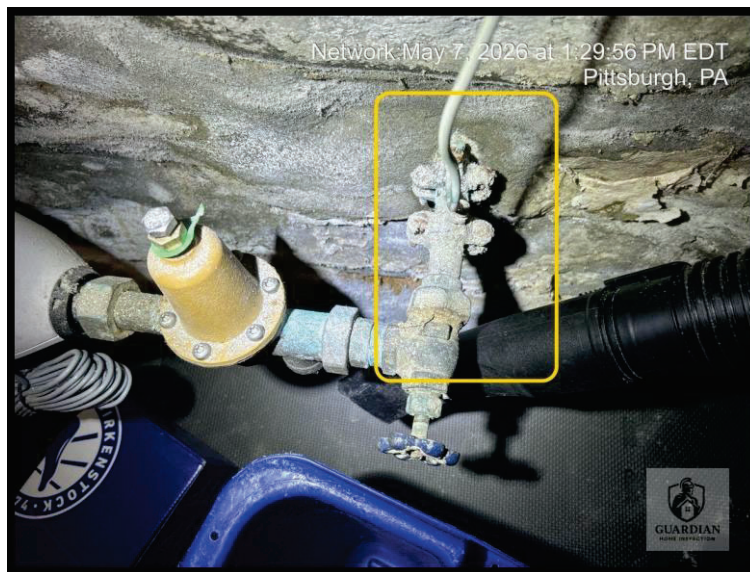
Corrosion was observed on the water line where it enters the home along the front-facing foundation wall in the basement.
